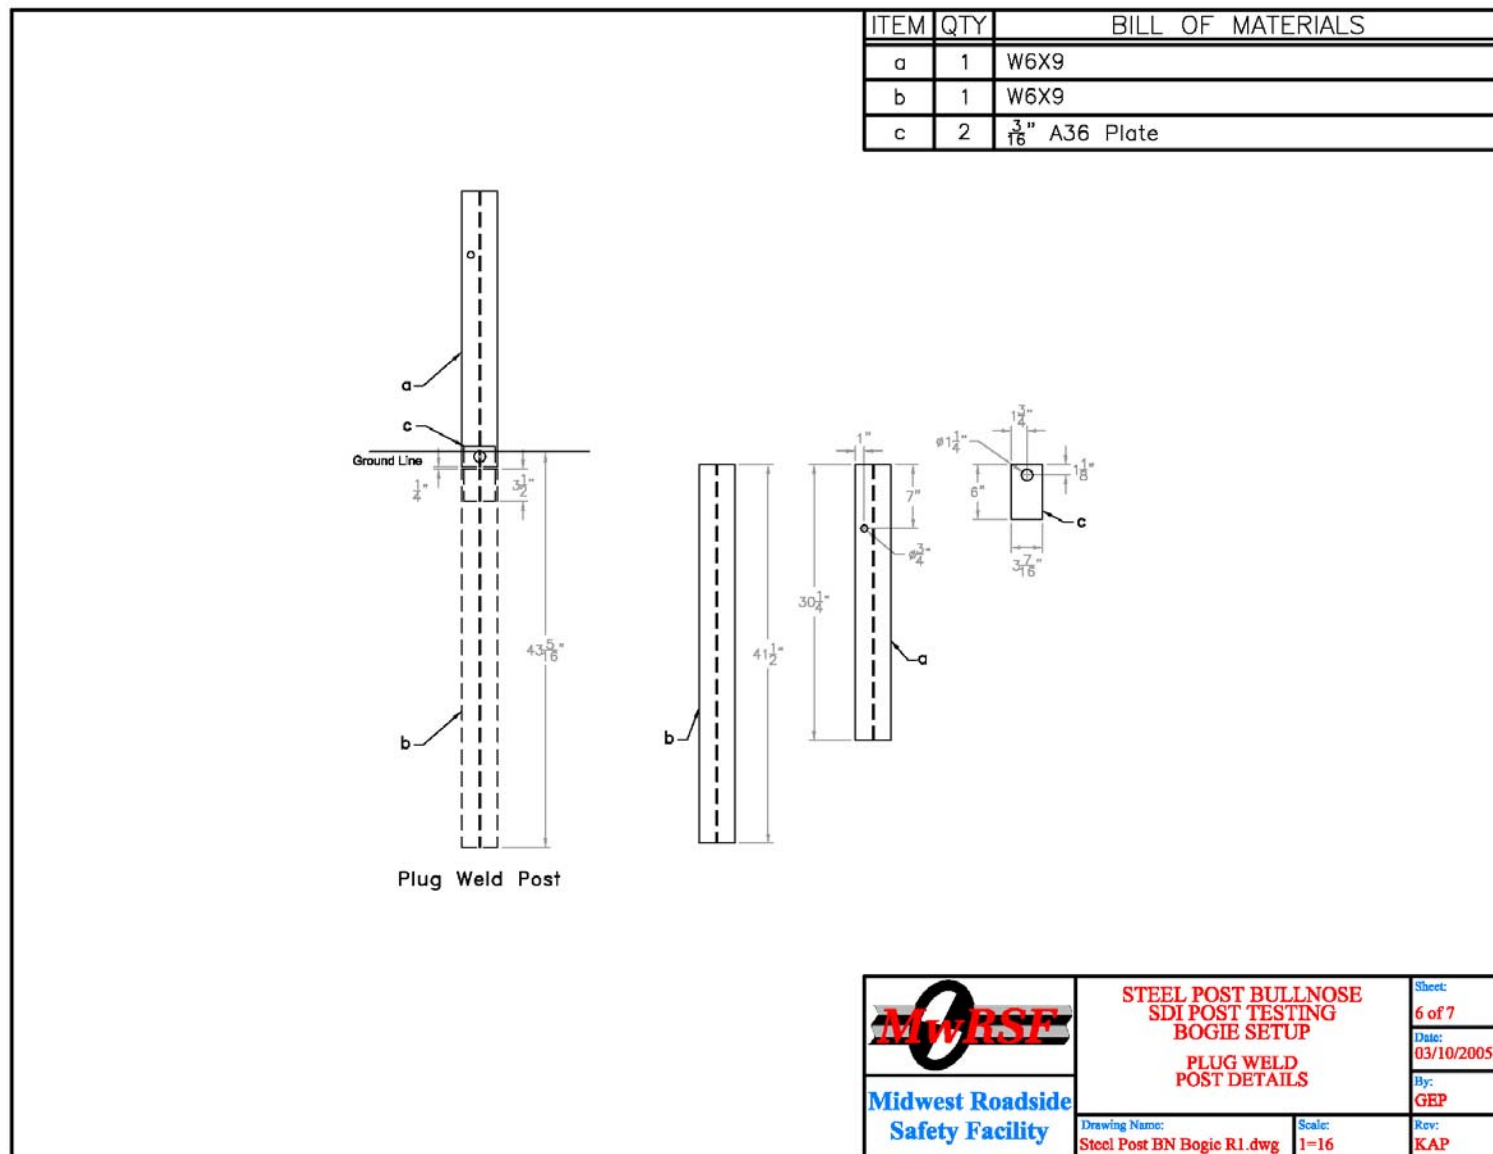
Breakaway Post Component Testing, Plug Weld Post Design
